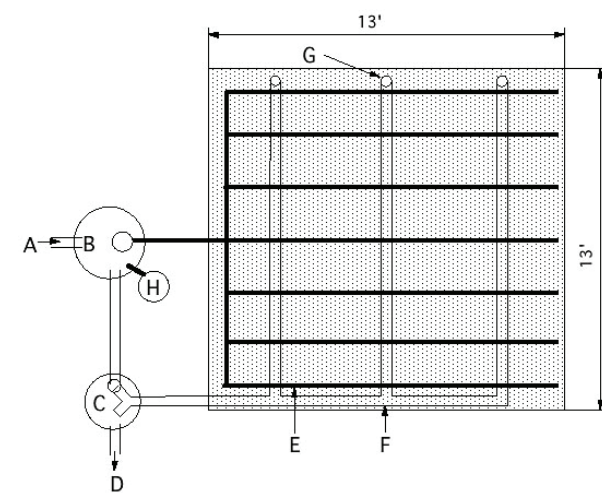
Vertical Subsurface Flow Wetland, Plan. A – Inflow from residence. B – Septic tank C – Recycling tank with V-notch weirs. D - Effluent. E- 1 1/2" perforated PVC distribution piping, capped, 3' spacing. F – 4" perforated PVC drainage piping, 3' spacing. G – Aeration pipes connected to bottom drain H - Aluminum polychloride dosing chamber with air-lift pump in septic tank, for phosphorus removal. Source: Adapted from Brix, 2005
